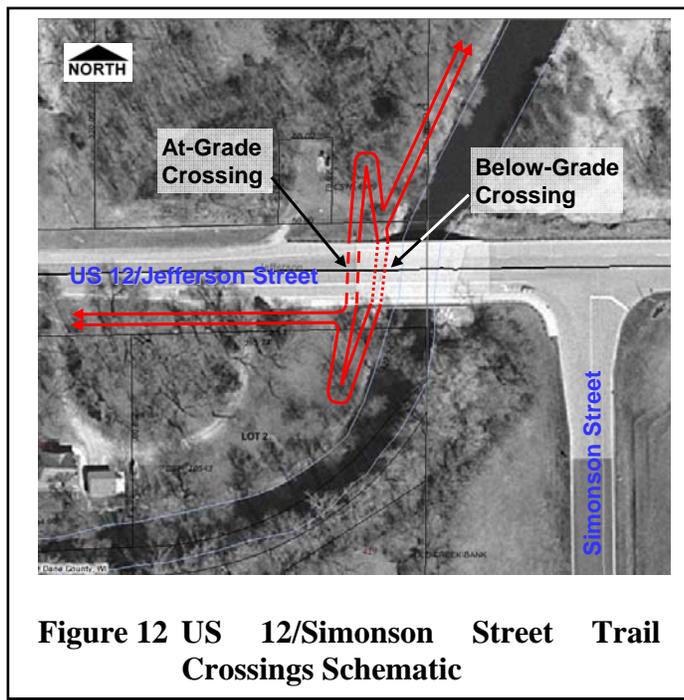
US 12/Simonson Street Trail Crossings Schematic
